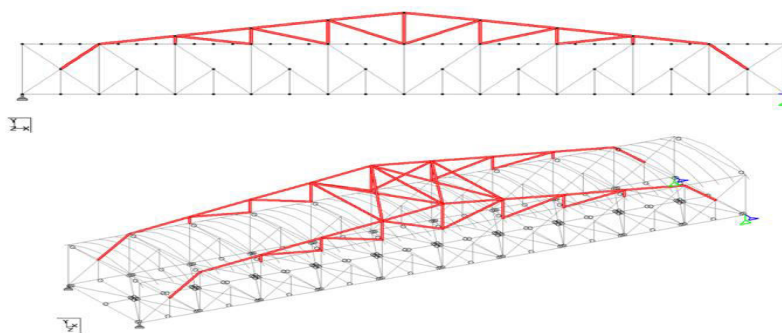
The Adopted New Frame on Top of Girder to Control Further Deflection
